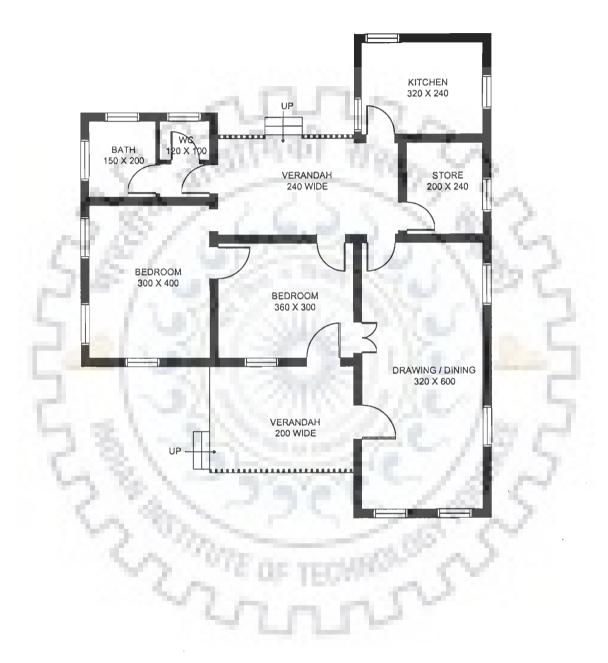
Plan of Project No. 6 (Plinth Area = 93.72 sqm; Floor Area = 78.66 sqm)
